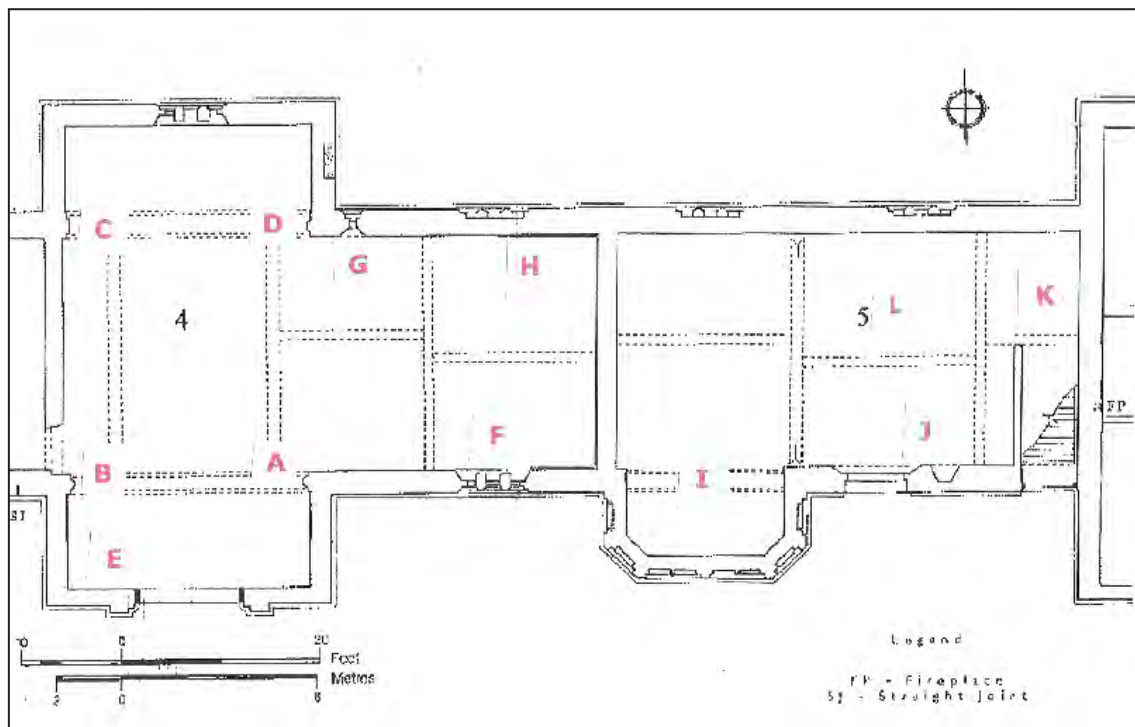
A plan of the Coach House and West Stable showing where the sections of plaster were removed.
